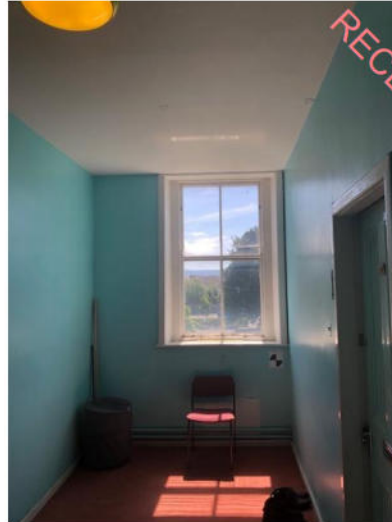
Modified upper level. Dropdown beam supporting vertical extension over. View facing south-west. Contemporary linings and loss of original layout evident.
